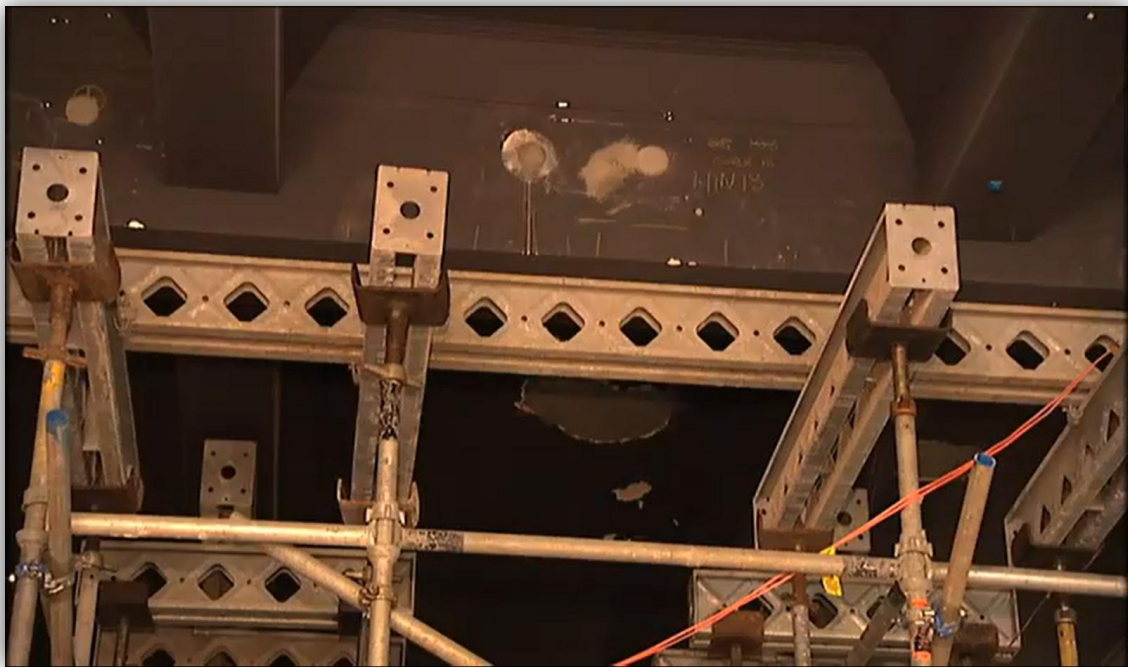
Photograph showing the test of girders under load (Source: The Soul of Brisbane)
